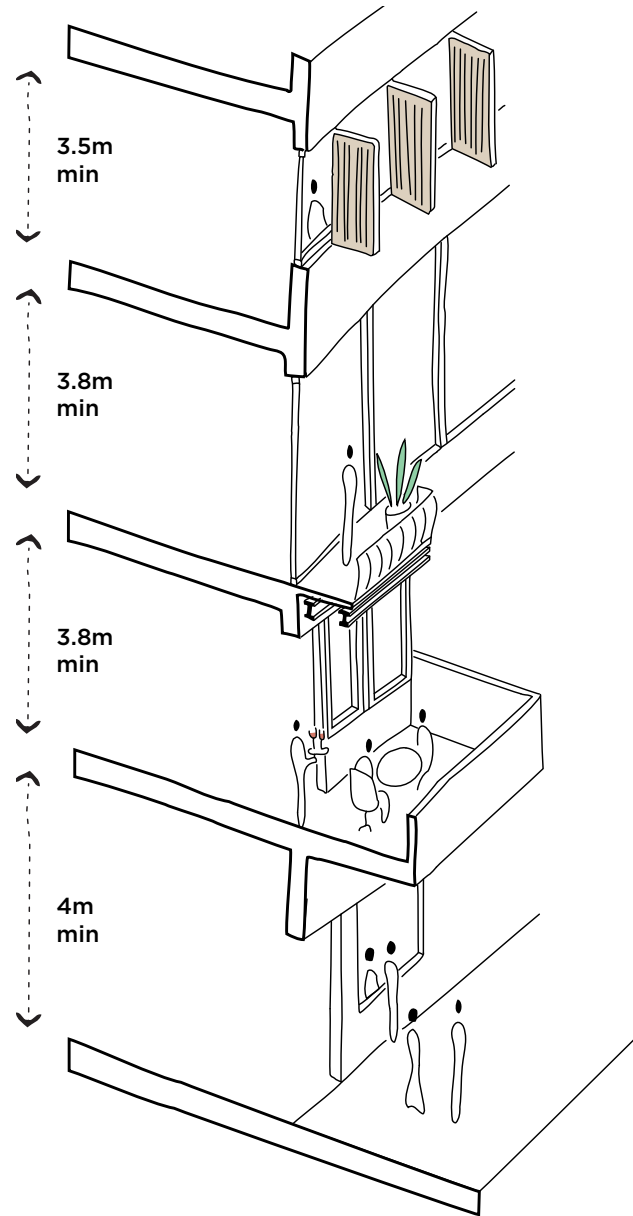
Generous ceiling heights are provided on the lower levels of the building to allow uses to adapt over time.
